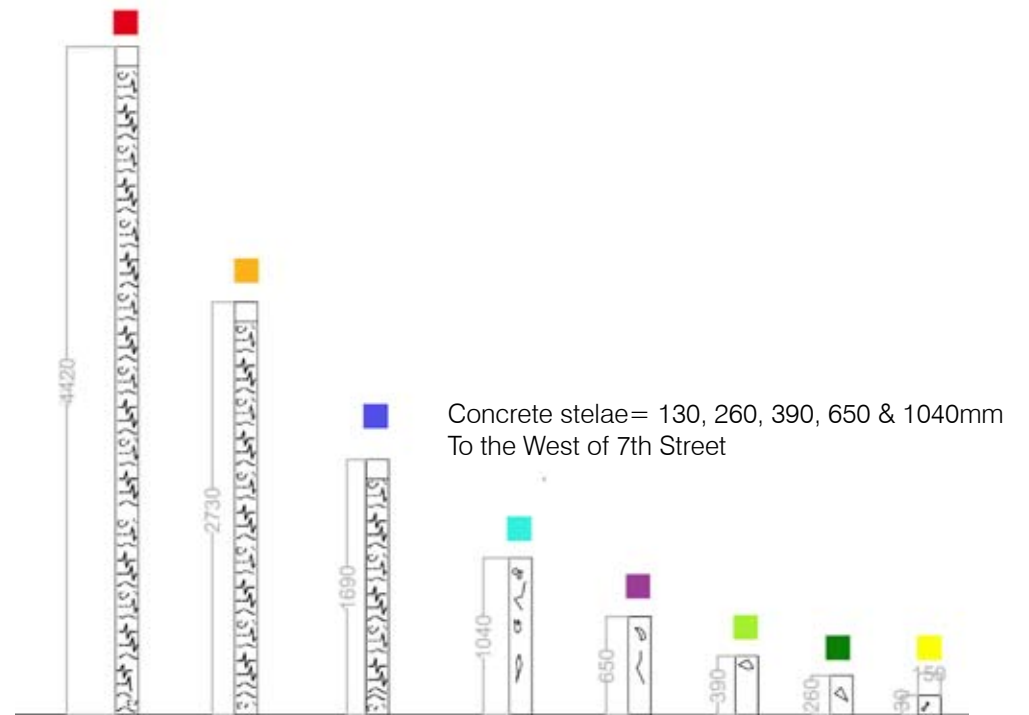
Plan of Concrete Stelae and Steel Light Columns (NTS, Author, 2009)
